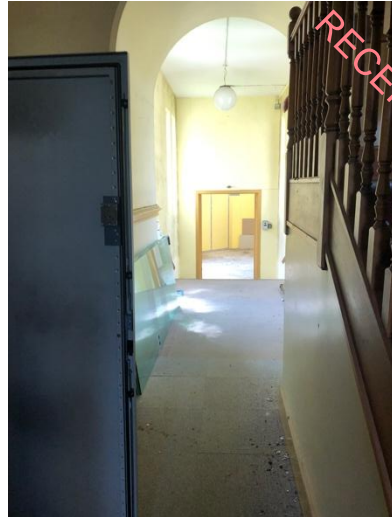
Opposing view from link to archive building, back towards rear extension to MPH.
